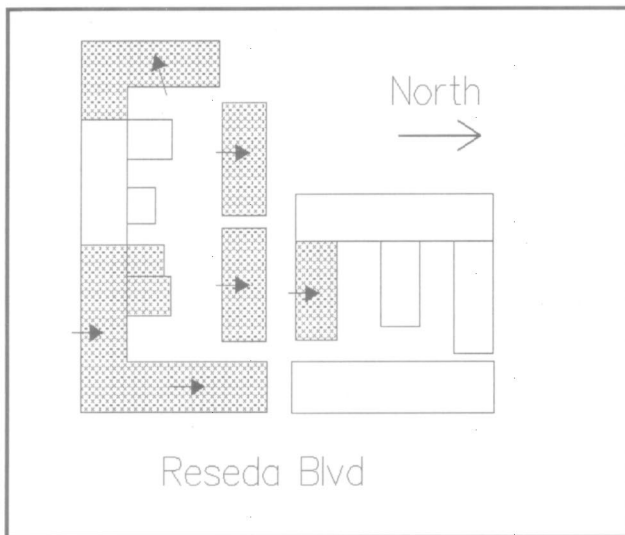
Meadows Apartment: General plan layout Shaded blocks collapsed in direction of arrows
